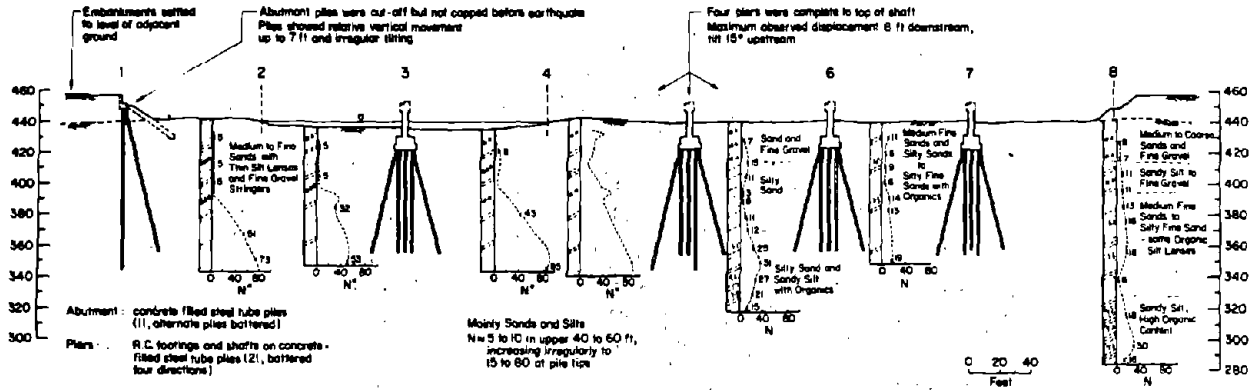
Bridge 605A (during construction): Snow River (centerline section looking downstream - natural scale).
